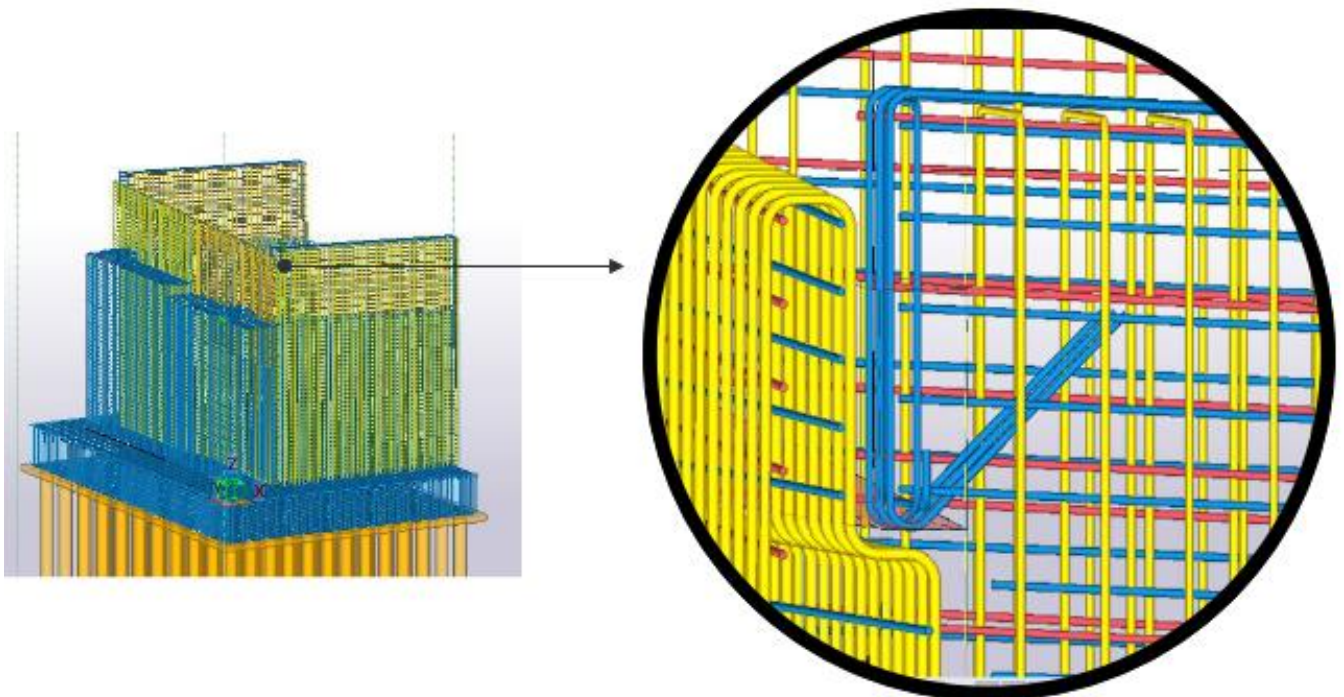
Lateral Panel of the abutment Reinforcement detail
